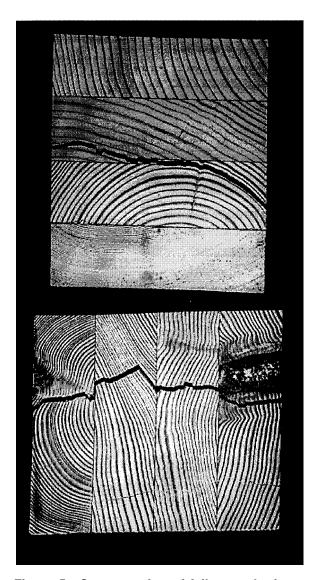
Cross section of failure paths in 130- by 152-mm specimens: (top) edgewise tests (bottom) flatwise.
